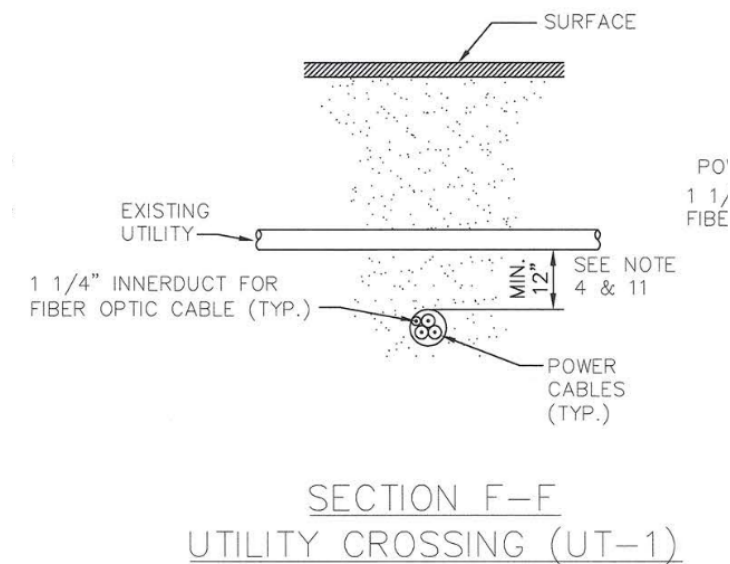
PROPOSED CROSS SECTION 3 – UNDERGROUND CABLE UNDER A PIPELINE CROSSING
